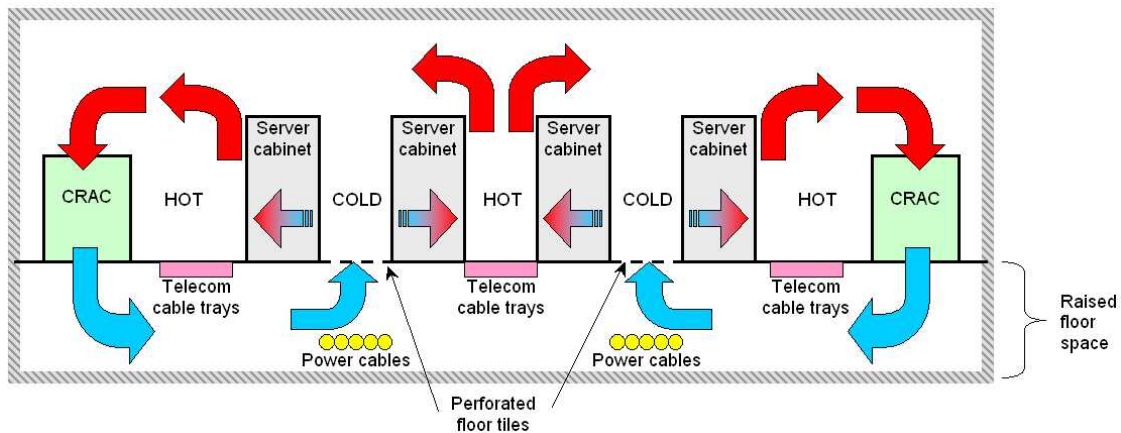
Placement of Cable Trays in Hot Aisle/Cold Aisle Layout
